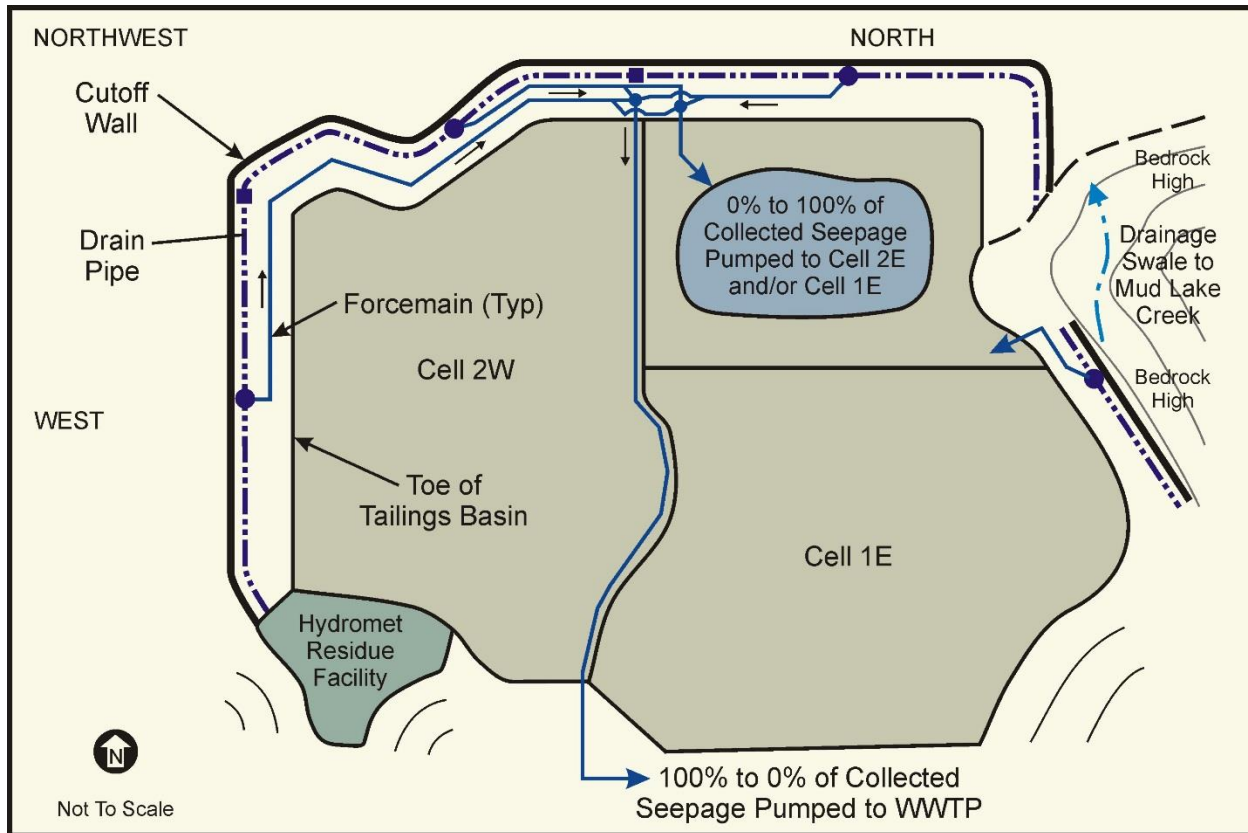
Conceptual Plan View: FTB Seepage Containment System
